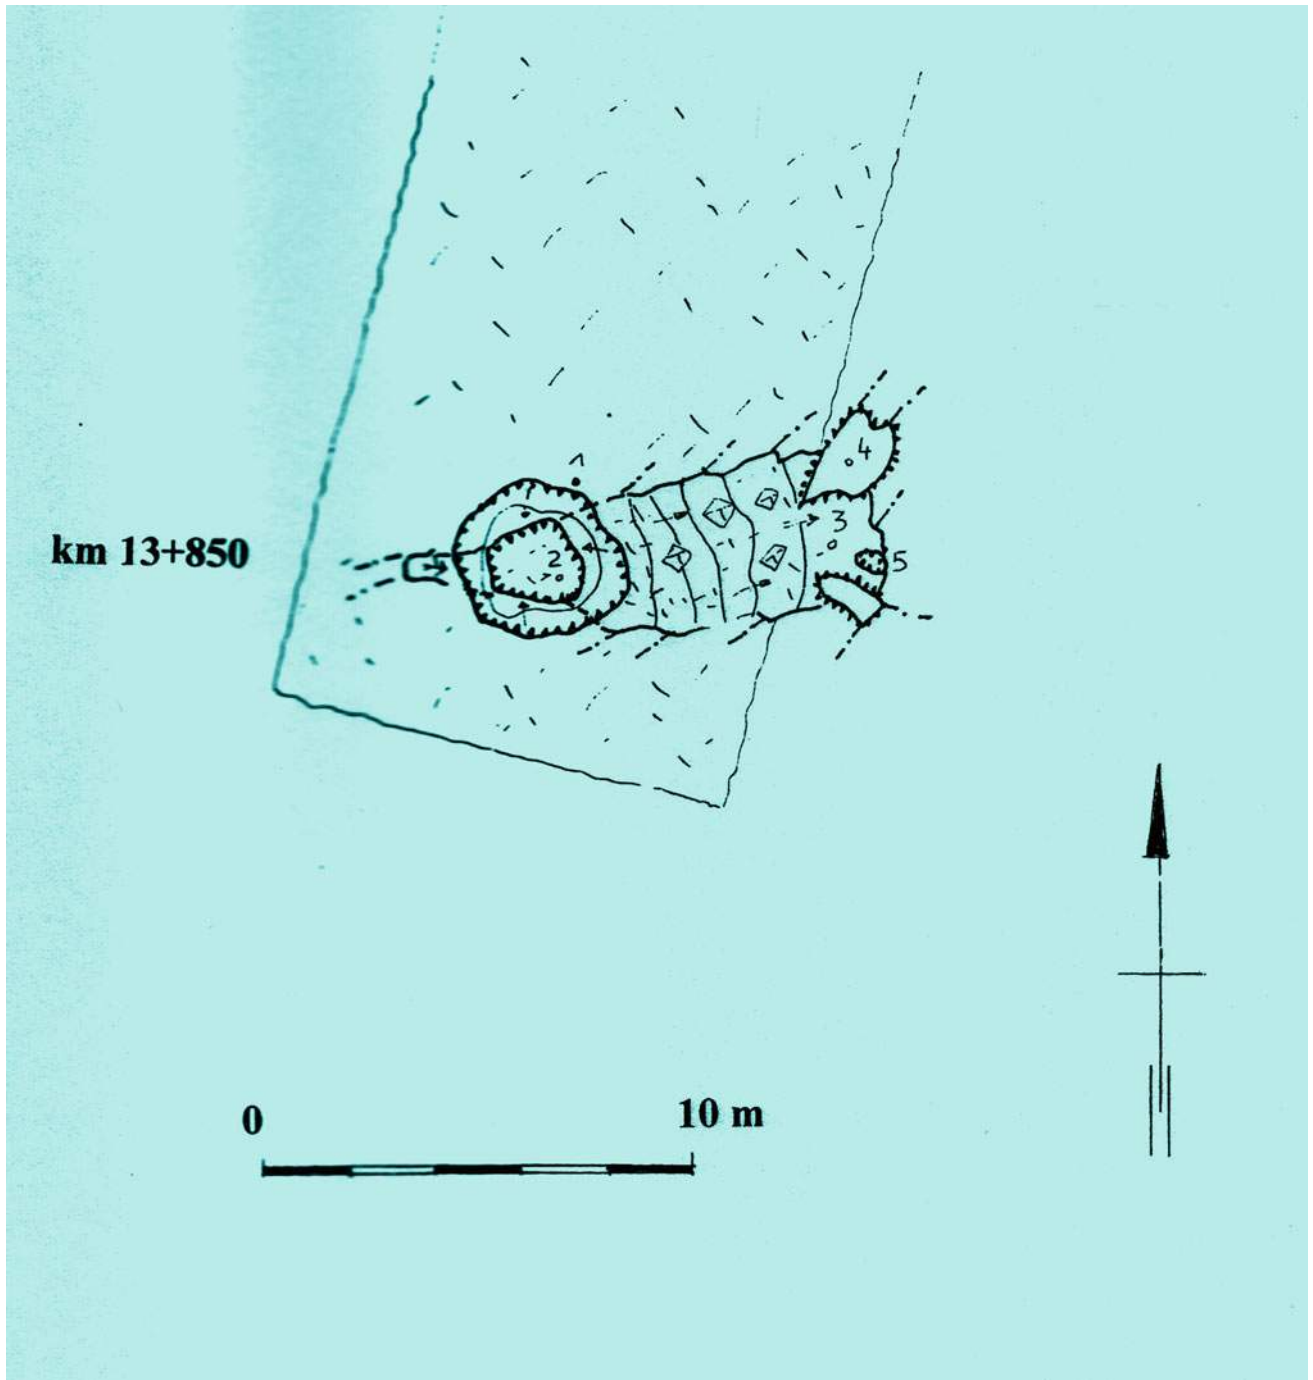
Plan of cavern at km 13 + 850 in Brinje Tunnel
